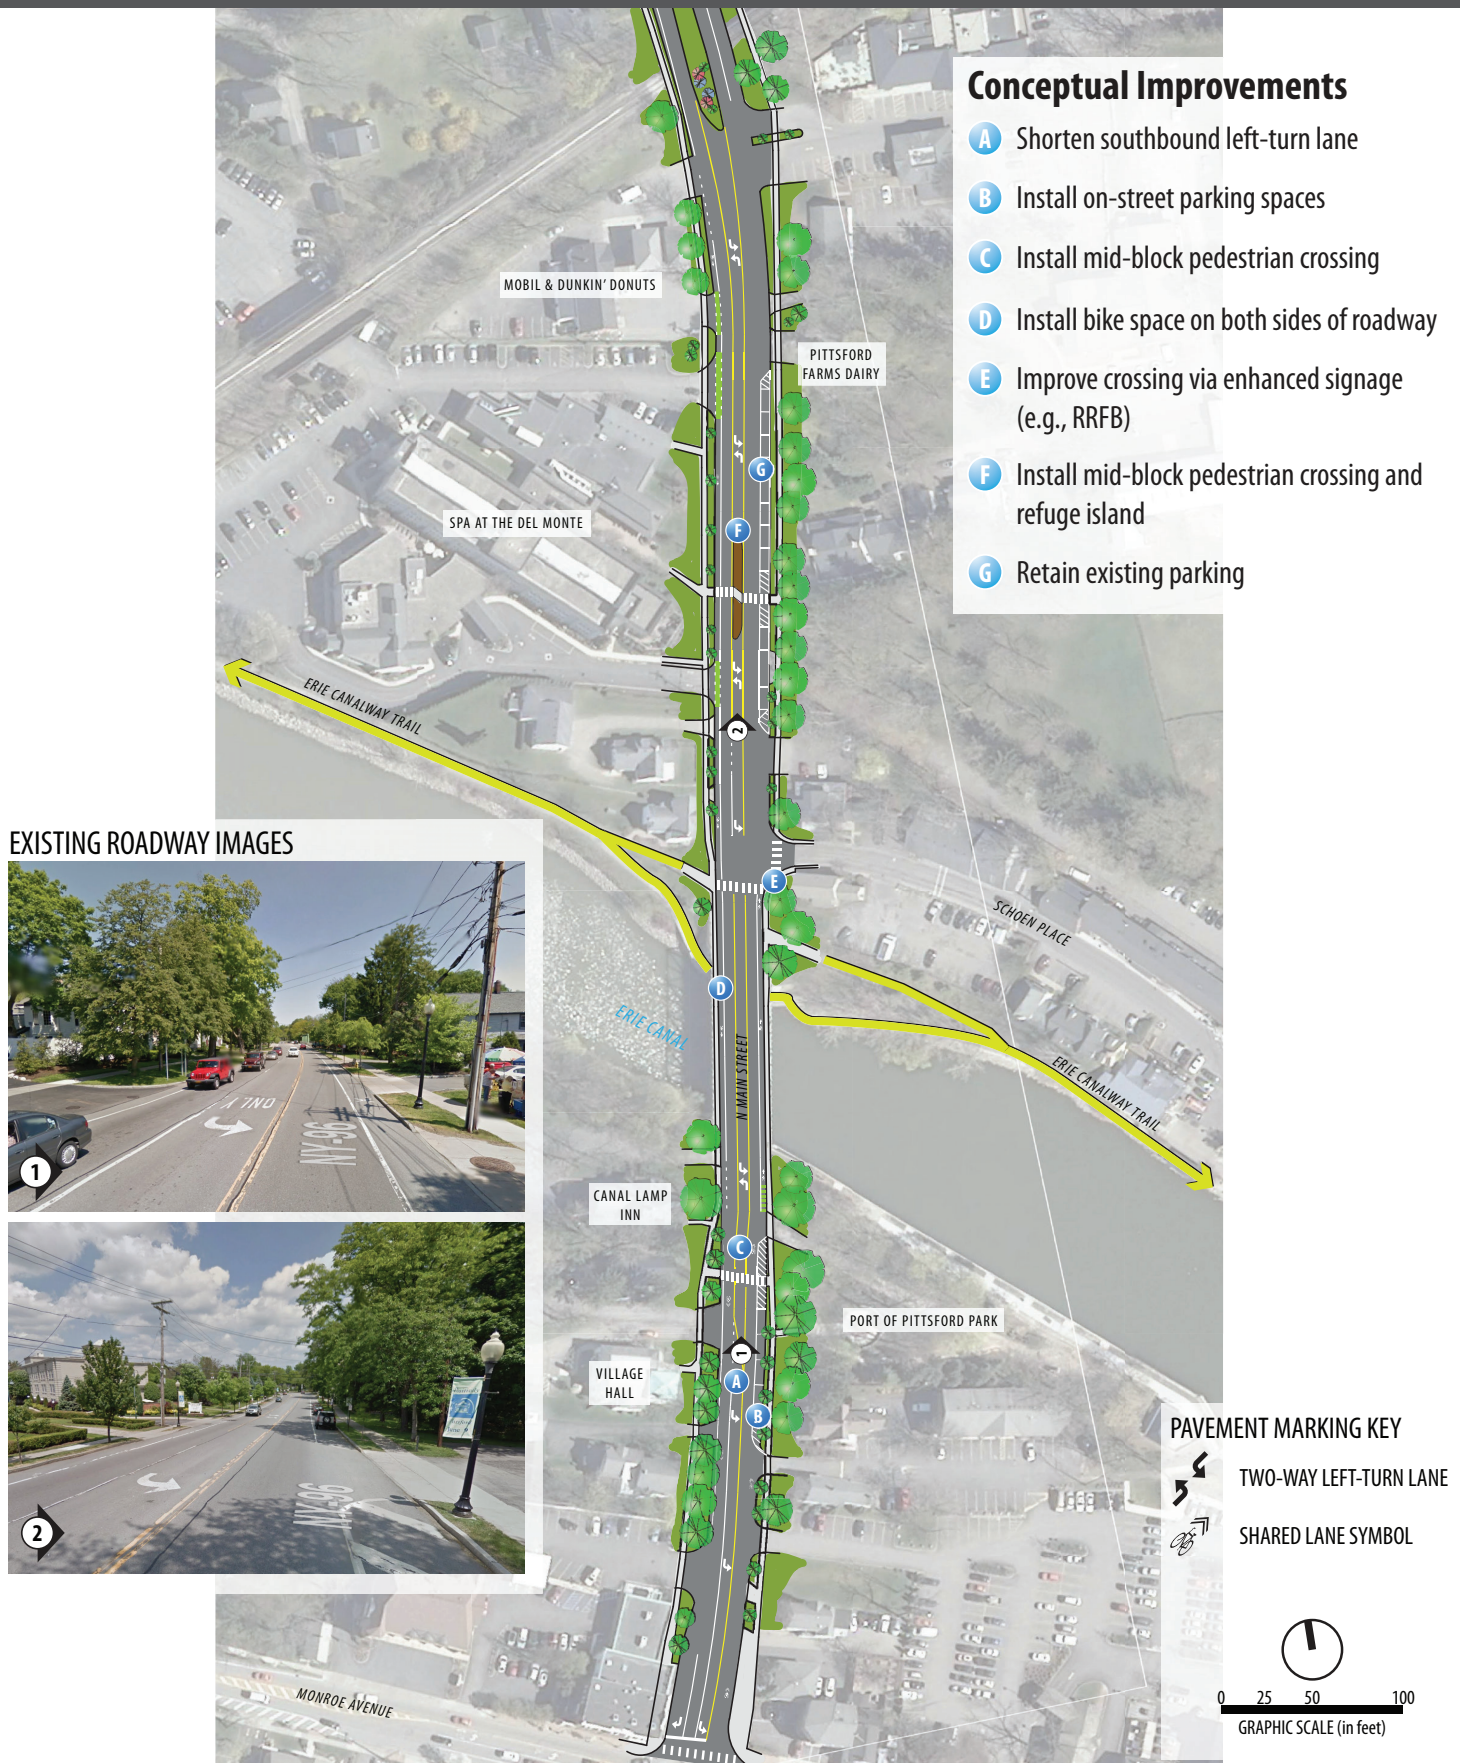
Conceptual North Main Street Transformational Streetscape Plan
